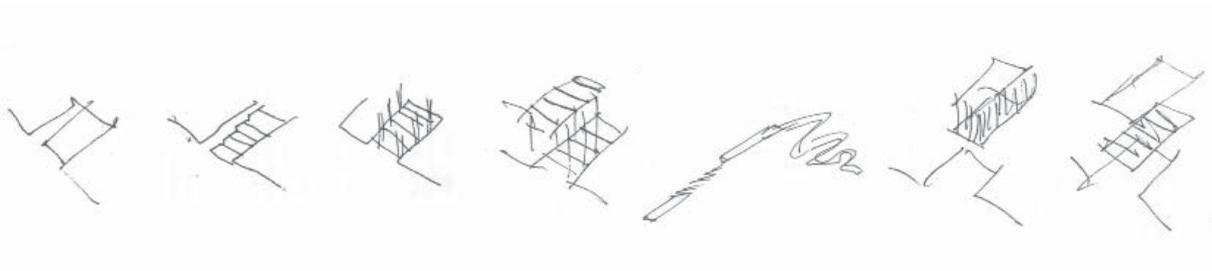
The construction process: excavation, terracing, pile foundations and columns, second level slab, bridge-stair-stoep-ramp, roofing and in-fill.
